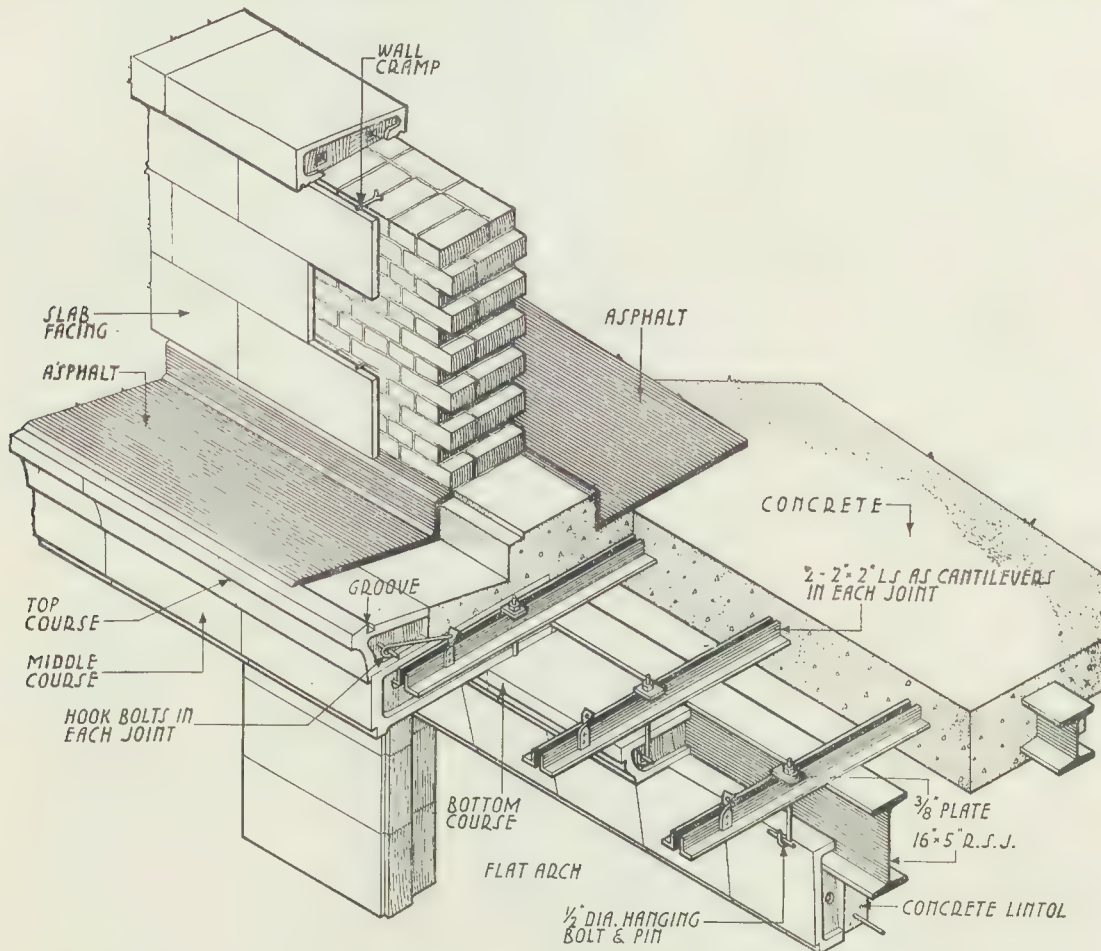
CONSTRUCTION OF TERRACOTTA CORNICE SUPPORTED UPON STRUCTURAL STEELWORK
